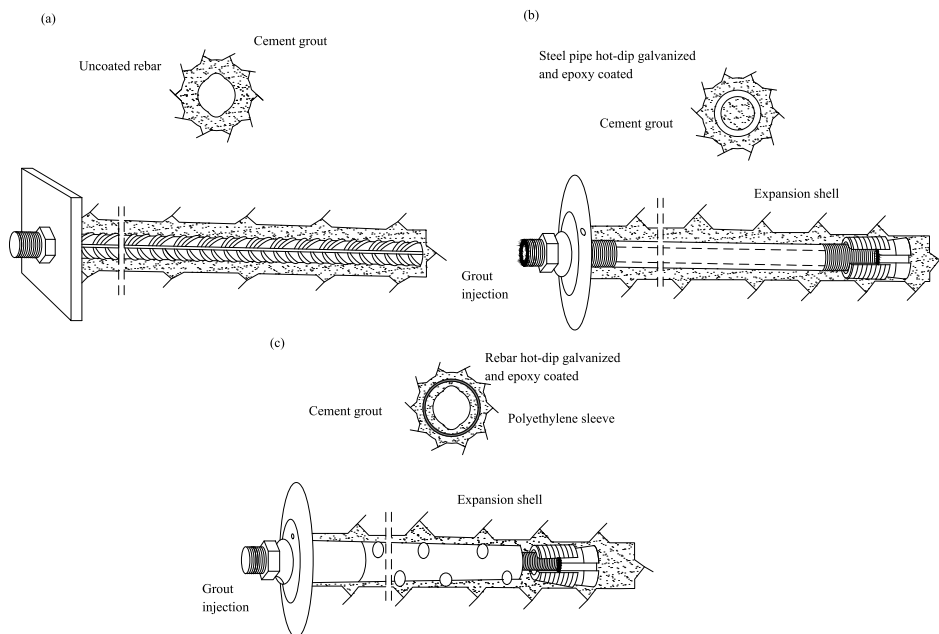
Some rock bolts used as permanent rock supports in Norwegian road tunnels. a Uncoated rebar cement grouted in the Haukeli road tunnel constructed between 1968 and 1969. The rebar is 20 mm in diameter and 2.4 m long (Pedersen and Hafsaas 1991). b Pipe bolt used in Byfjord and Mastrafjord subsea road tunnels constructed between 1989 and 1992. The 3-m-long rock bolt, steel pipe
